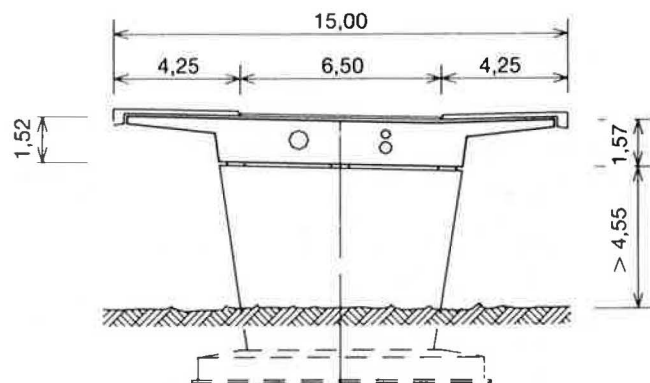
Ulenbergstrasse Road Bridge, Düsseldorf, cross section.
